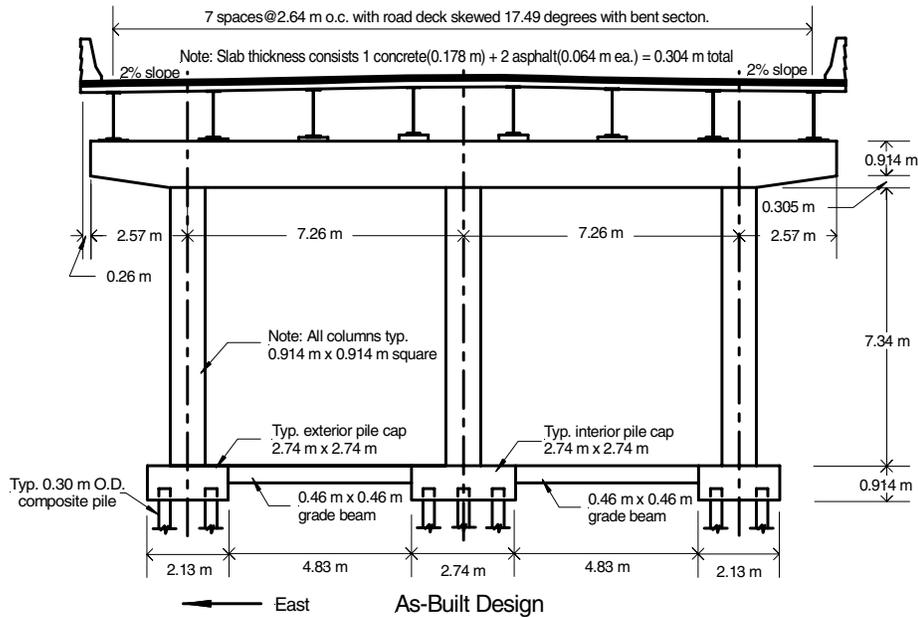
Typical bent structure for both the 1998 and 2000 bridge tests.
